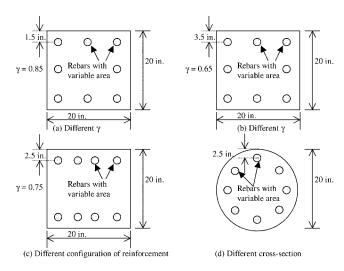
Cross section of typical reinforced concrete columns considered in parametric study.
